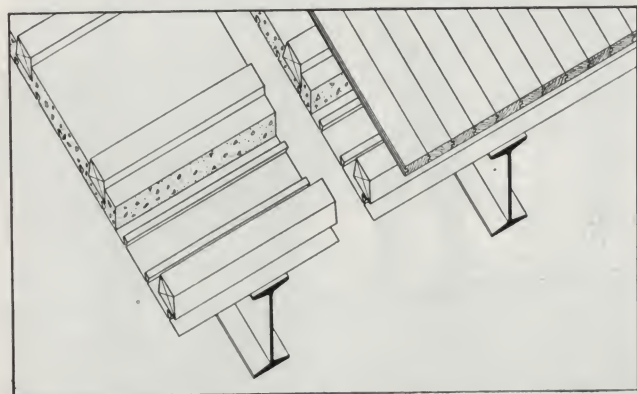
Concrete Slab May Be Cast on Ribbed Sheet Metal Which Is Laid Across the Steel Joists
